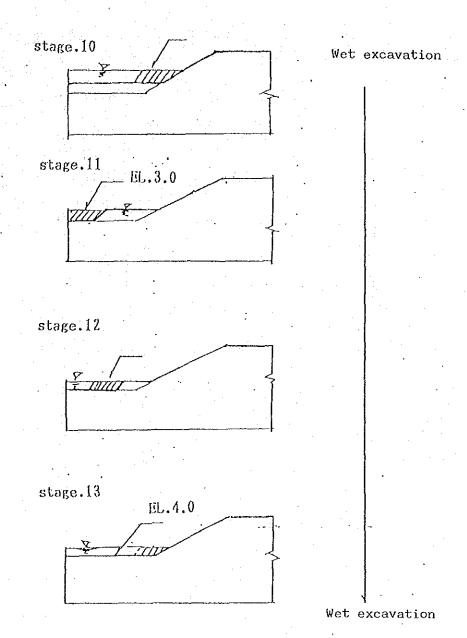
Excavation Stage and Boundary Condition of Ground Water Level (2)
